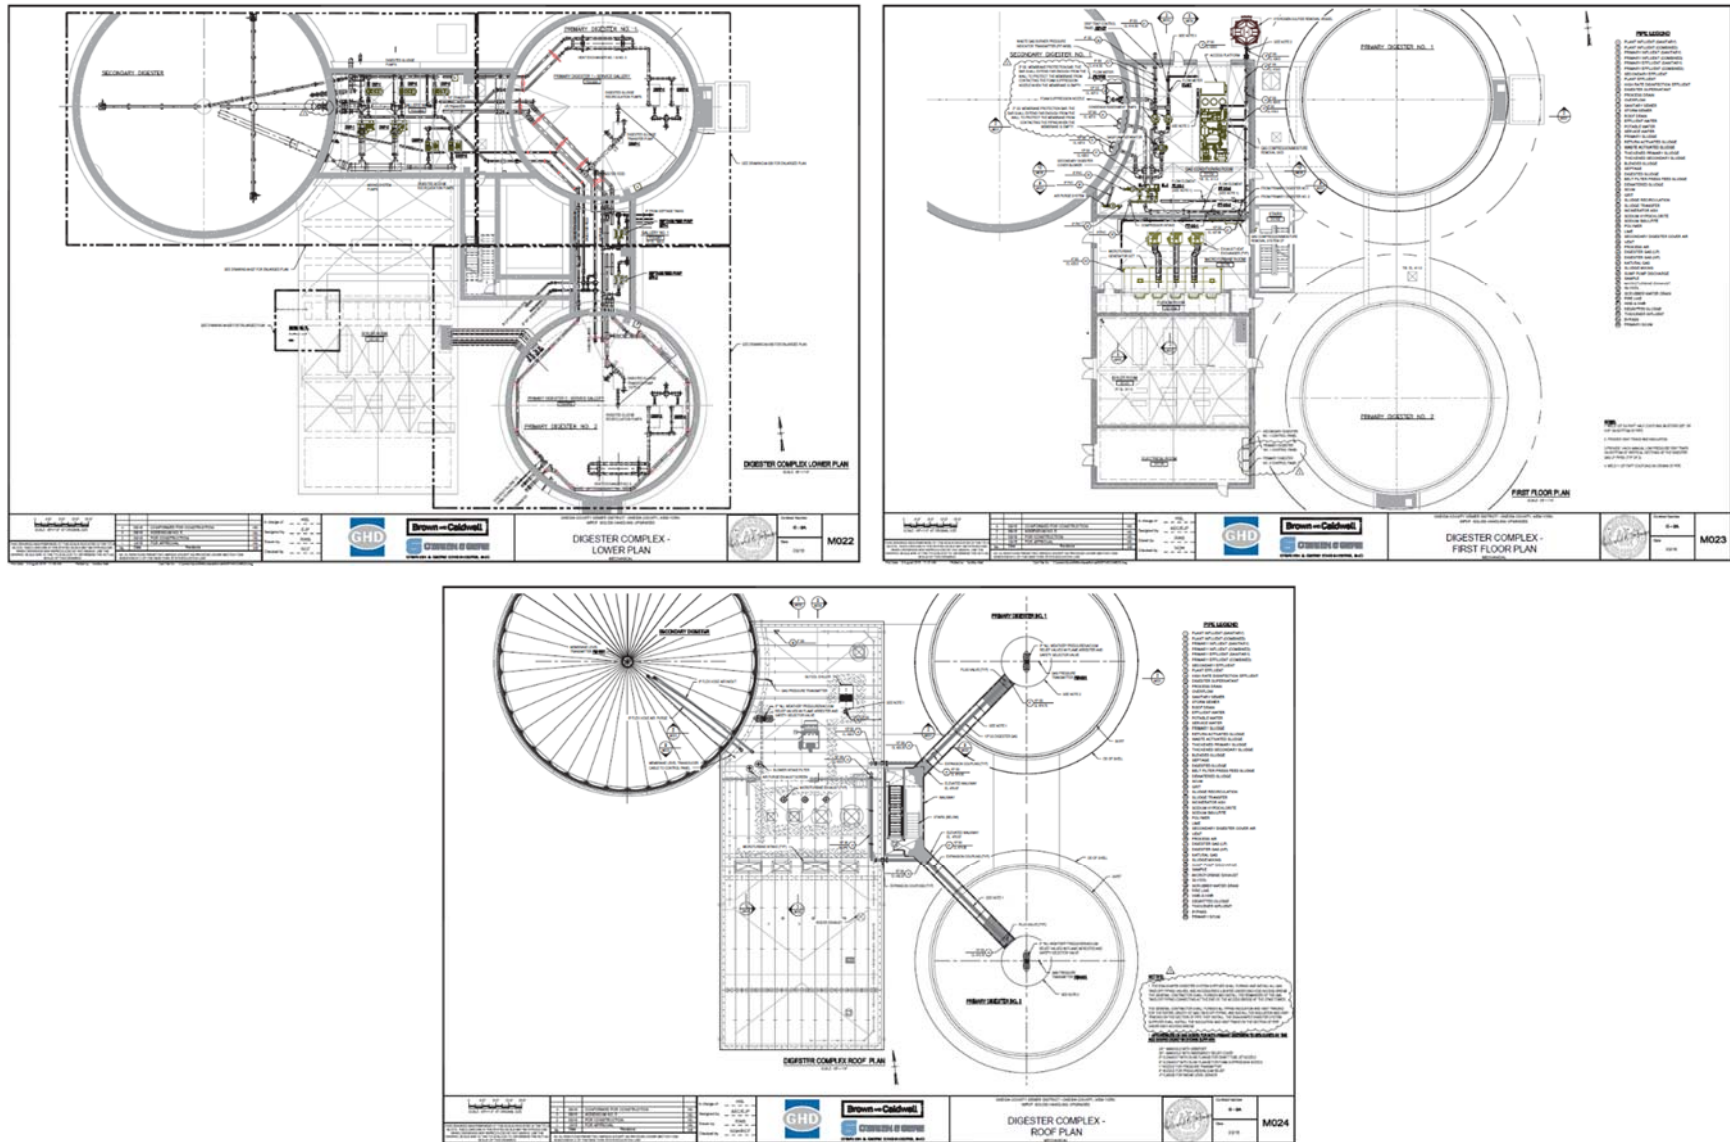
Digester Complex Lower Plan (Top Left), First Floor Plan (Top Right), and Roof Plan (Bottom)
